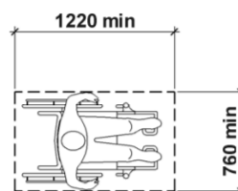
Dimensions of space occupied by a wheelchair in minimum "min" millimeters. [10]
